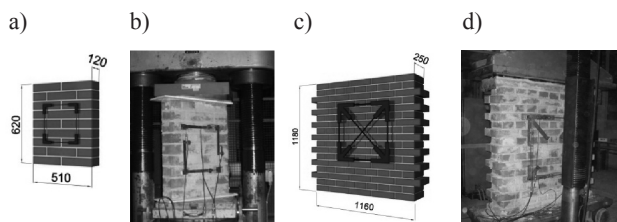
The shape, dimensions and view of both types of specimens prepared for testing: a) CV type; b) MW type
